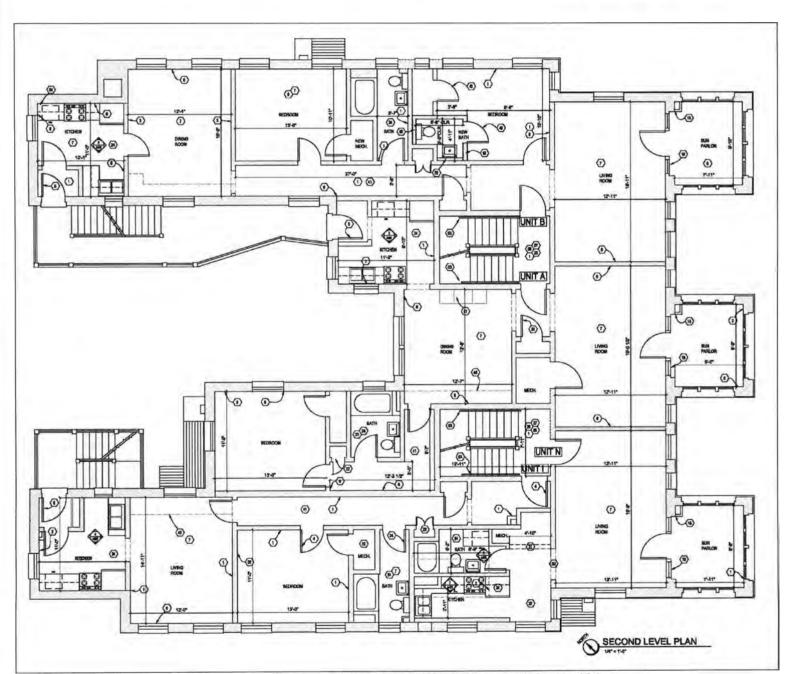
"First"/second floor plan (OPN Architects, Cedar Rapids)
